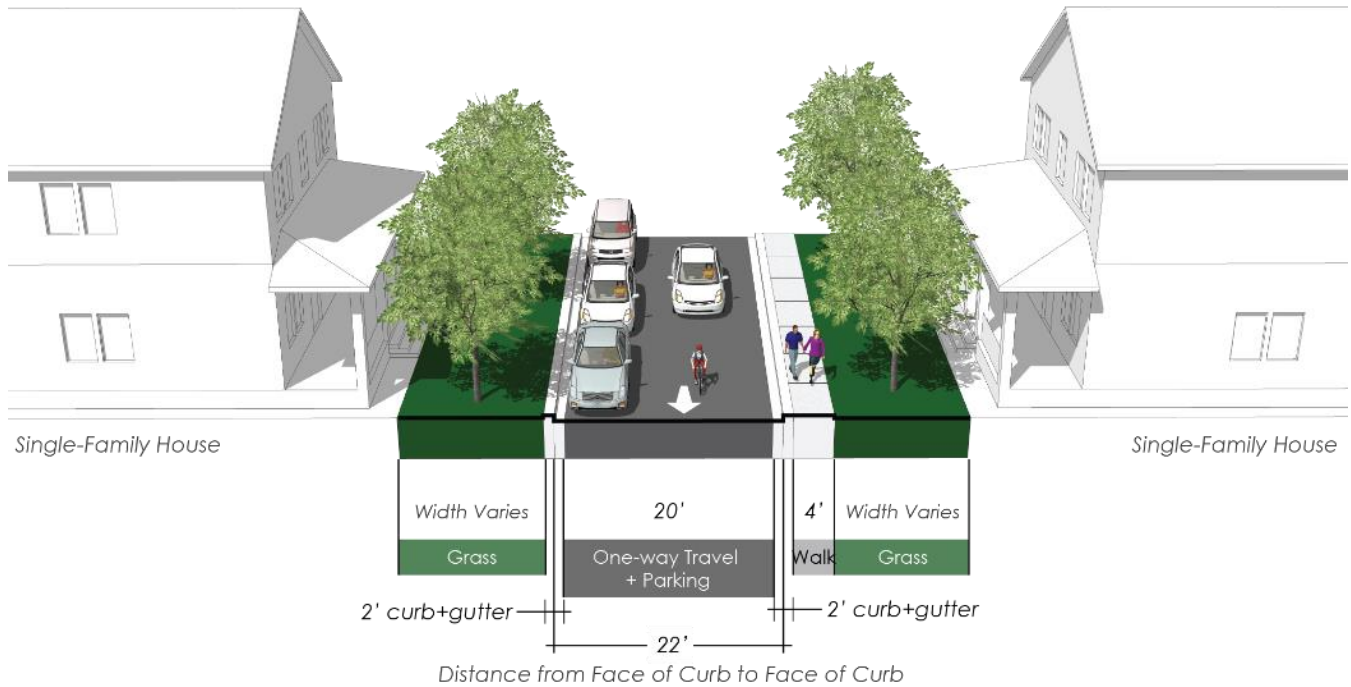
Chase Avenue – Tilbury Street to Pearl Street (Looking East)
